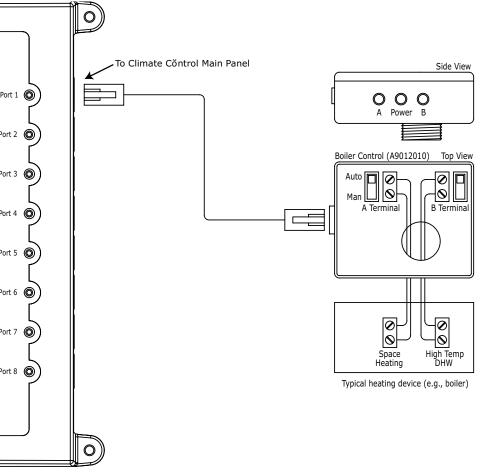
Typical wiring of a heating device using boiler control for space heating
